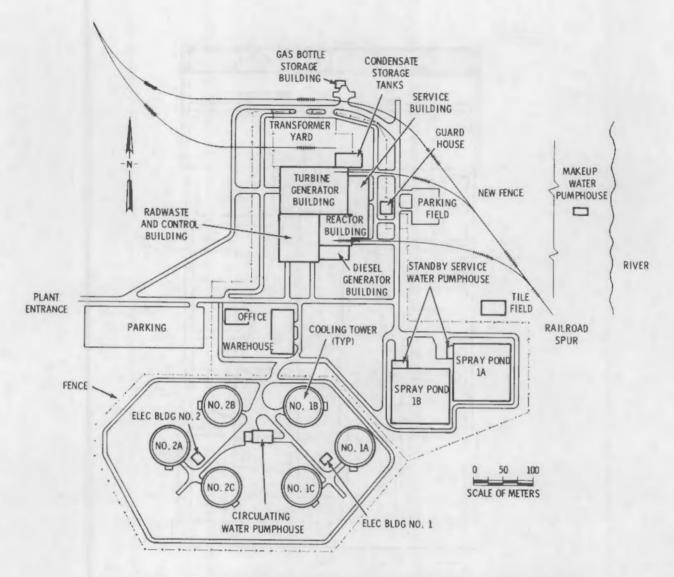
Site Layout of the Reference BWR Power Plant
